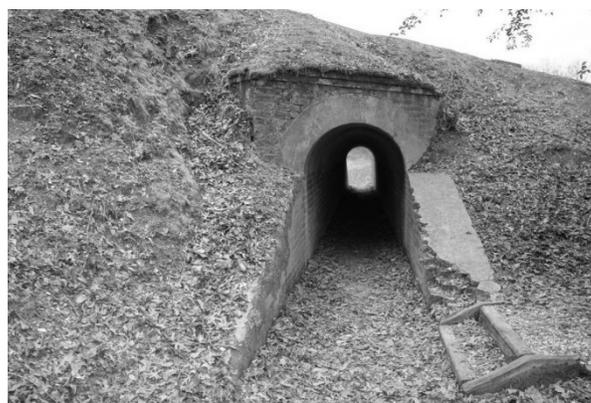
View south of the concrete tunnel leading beneath Union Avenue to the Thayer's Approach site. A tunnel has been present in this location since the siege.
